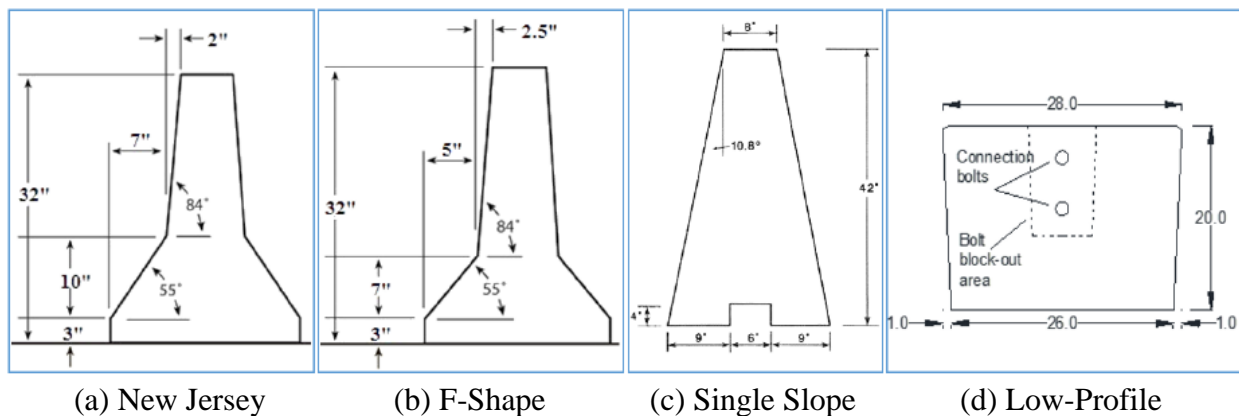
PCB Profiles: (a) New Jersey, (b) F-Shape, (c) Single Slope, and (d) Low-Profile [9]
